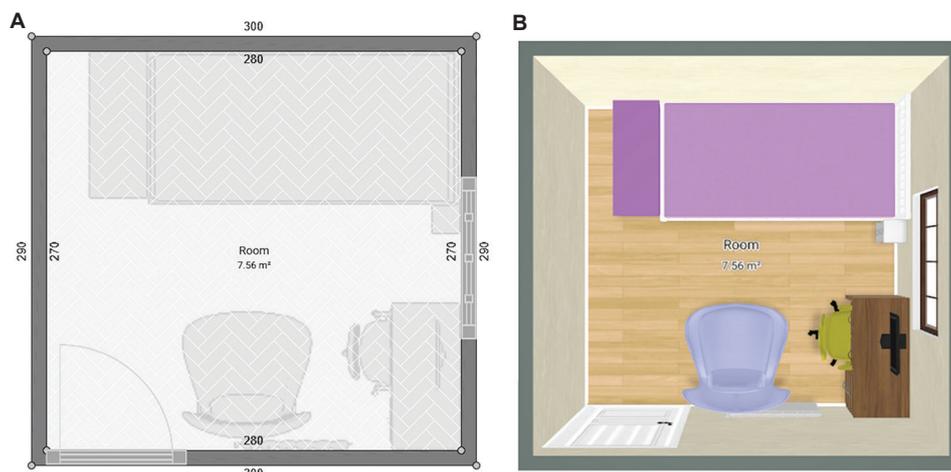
Medium room. (A) Floor plan; and (B) 3D Top view.
